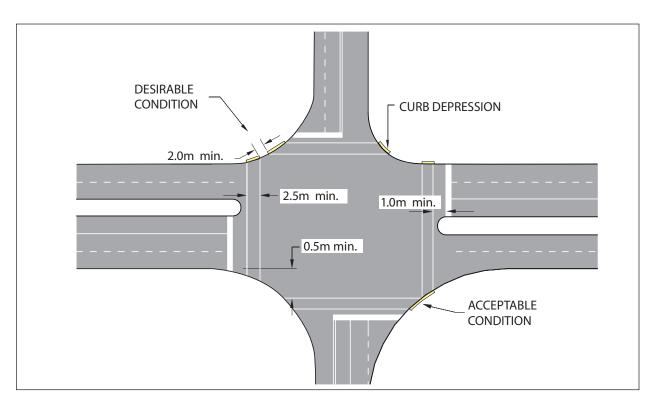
Typical Crosswalk Design with Standard Crosswalk Markings
